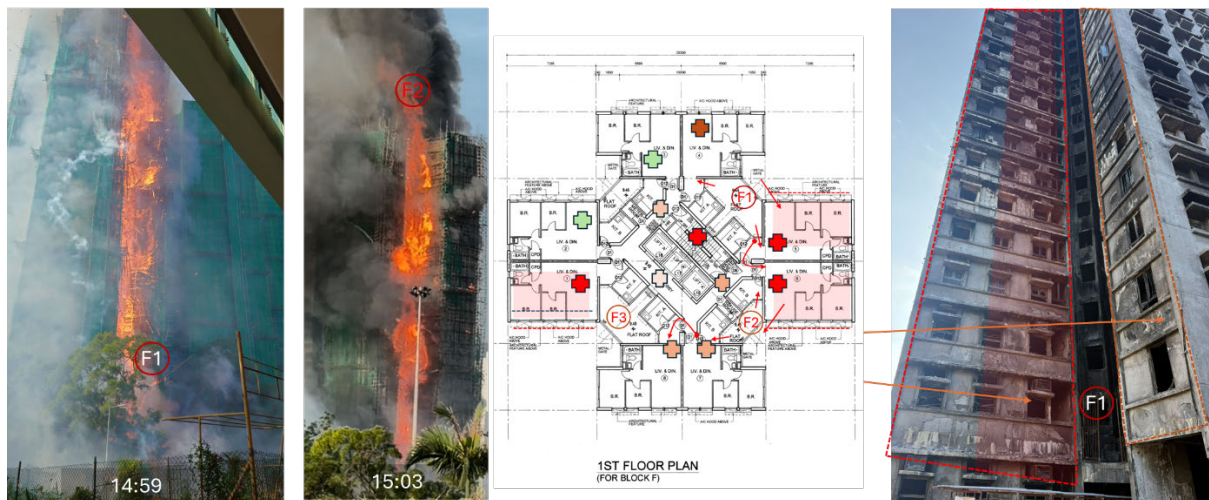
Room units with living room windows facing to extended re-entrant fire
